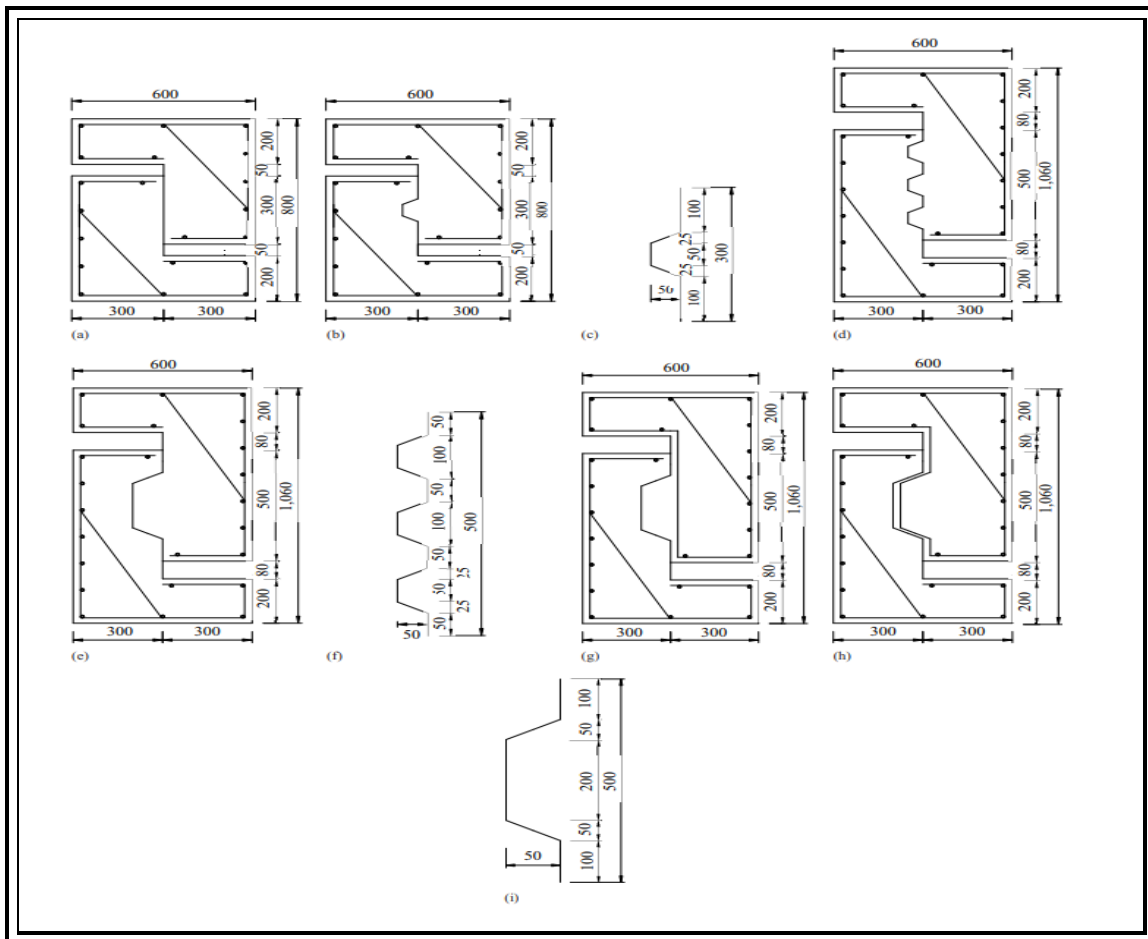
2. Specimen dimensions and configurations for test specimens (in millimeters): (a) flat joint; (b) single-keyed joint; (c) detail of a single key in the shear region; (d) three-keyed joint; (e) large-keyed joint; (f) detail of three keys in the shear region; (g) large-keyed joints with straight reinforced bars; (h) large-keyed joint with key-shaped reinforced bars; and (i) detail of a large key in the shear region. (Liu et al., 2019).
